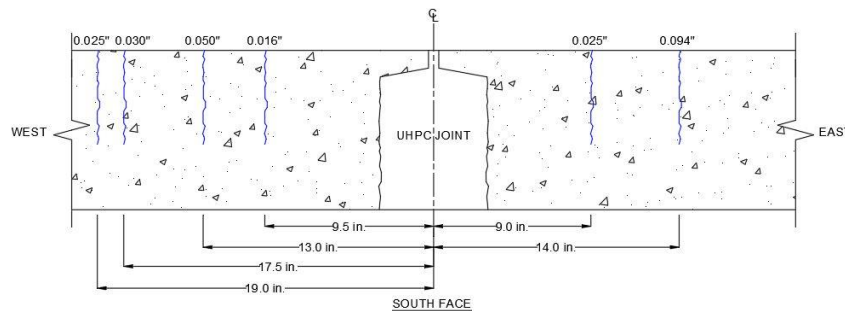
Locations and widths of cracks on south face of specimen at 42 kips.
